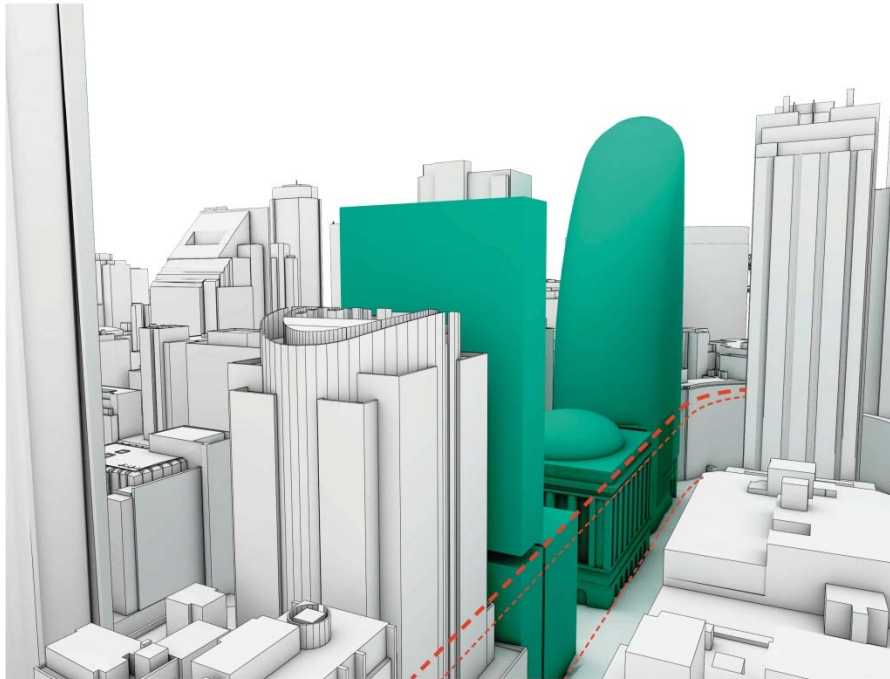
Precinct- key datum lines will form the detailed street wall articulation design differentiation
